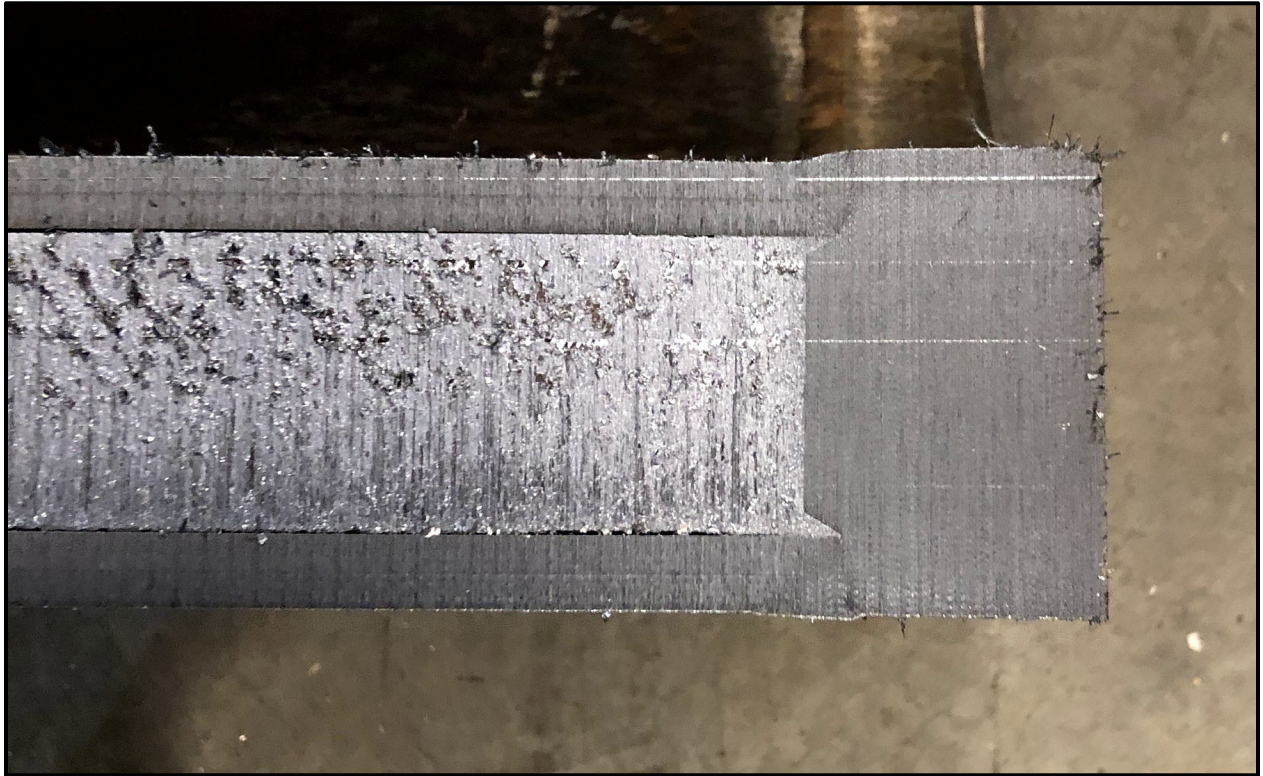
SC-55G2 18TU-09 Destructive Disassembly Cut AG/AH at Upper Flange
